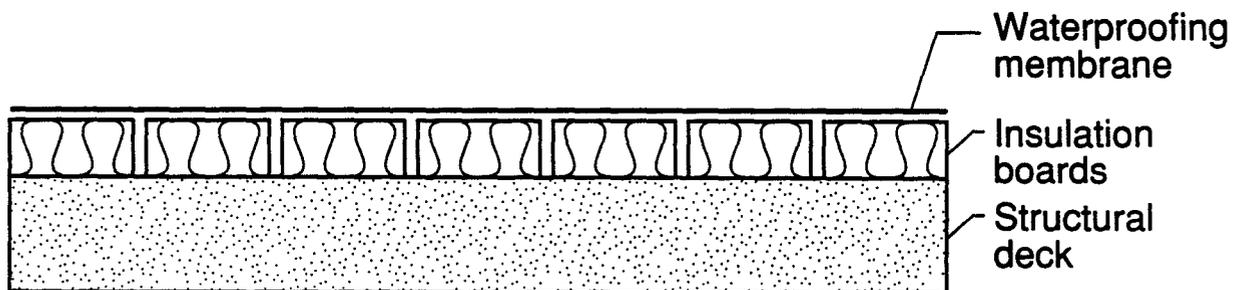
Main components of a low-sloped roof system: waterproofing membrane, insulation boards, and structural deck
